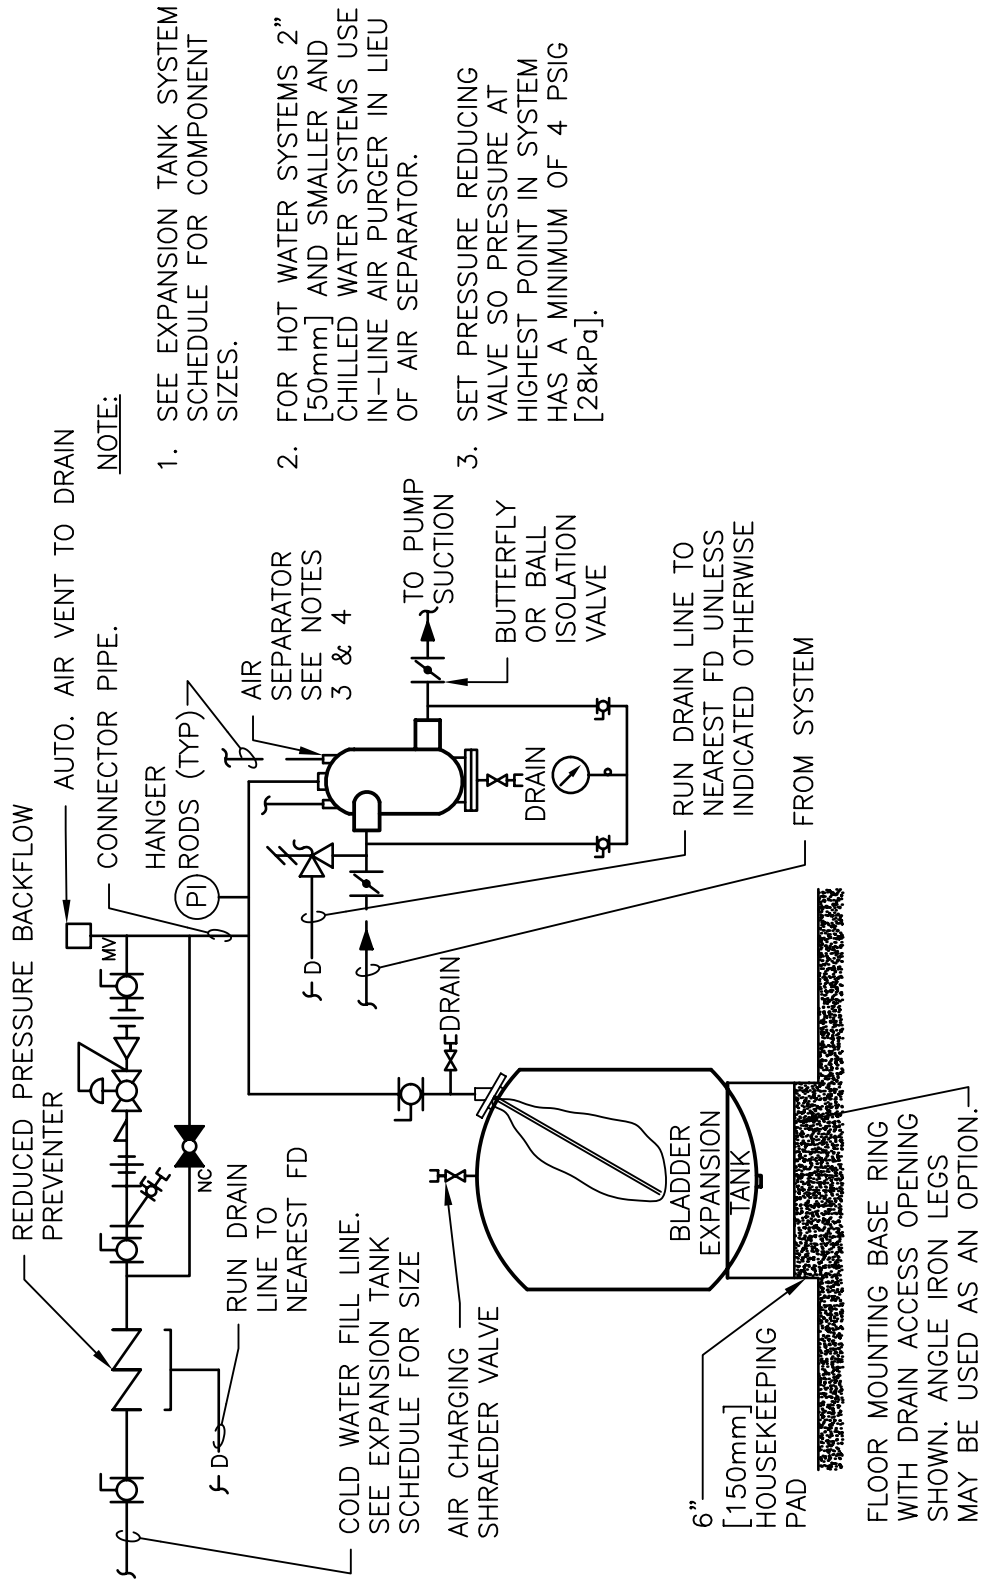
DETAIL TITLE / FLOOR MOUNTED EXPANSION TANK -
